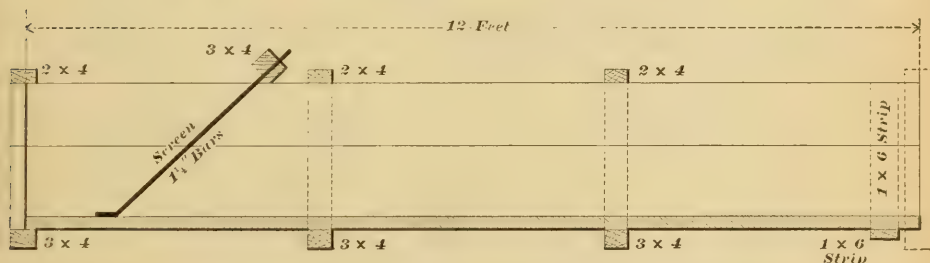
SECTION OF ELEVATION ON LINE *a b*, FIG. 5.
